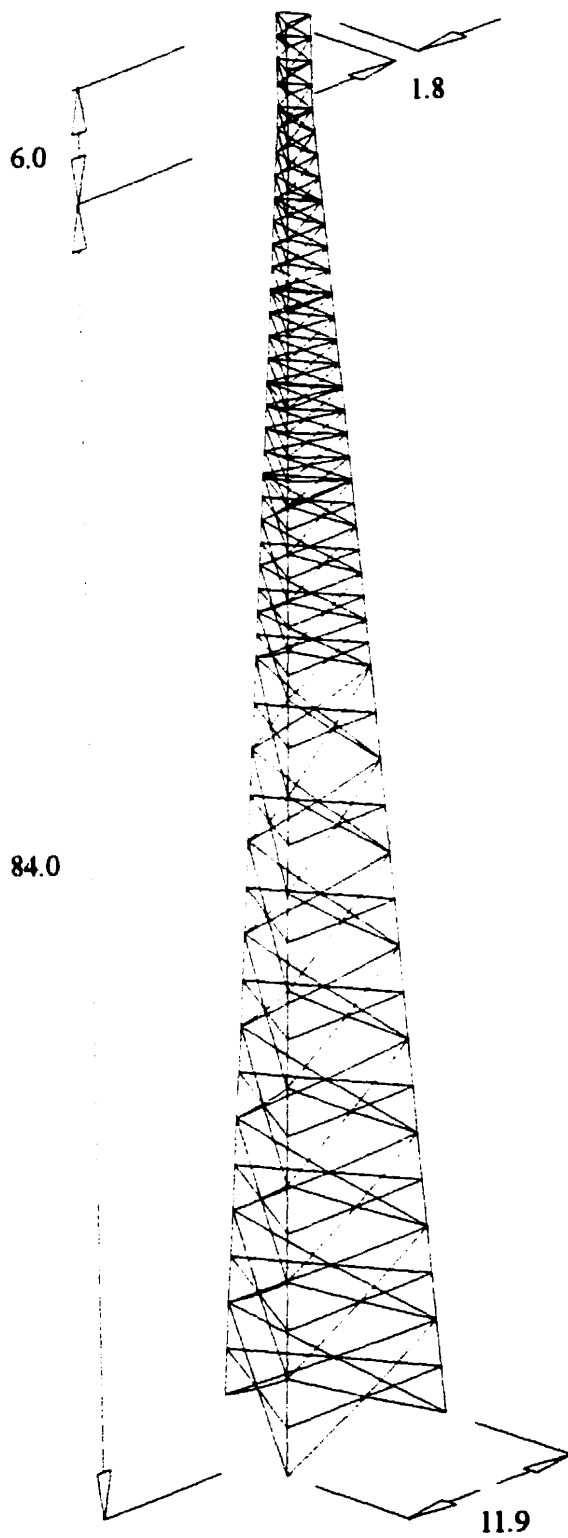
Layout of tower TC7 (dimensions are in m)
